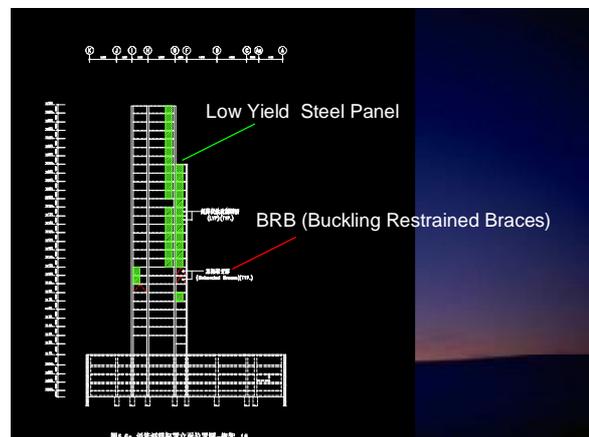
(b) Elevation View of one frame in Taipei County Hall
